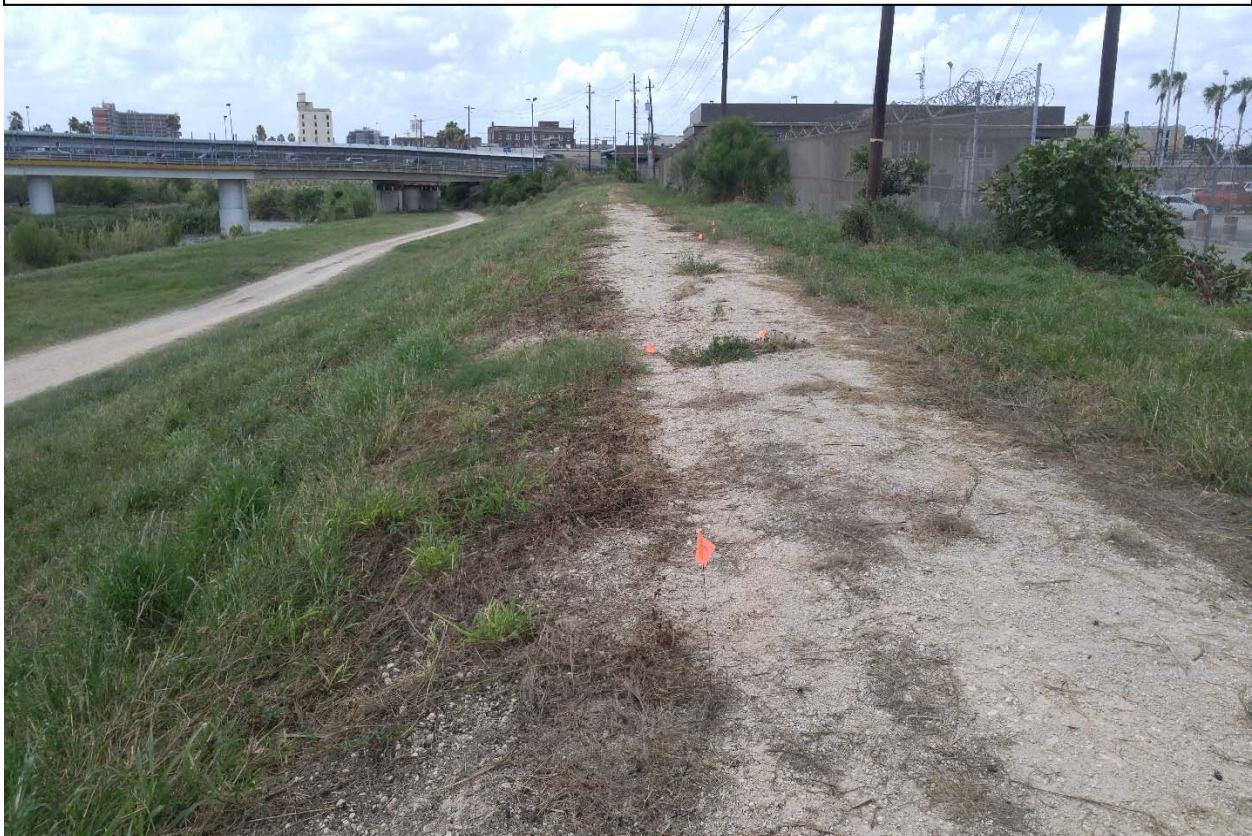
Looking North - Surface Tension Crack of Pin Flags 21B through 26B.
